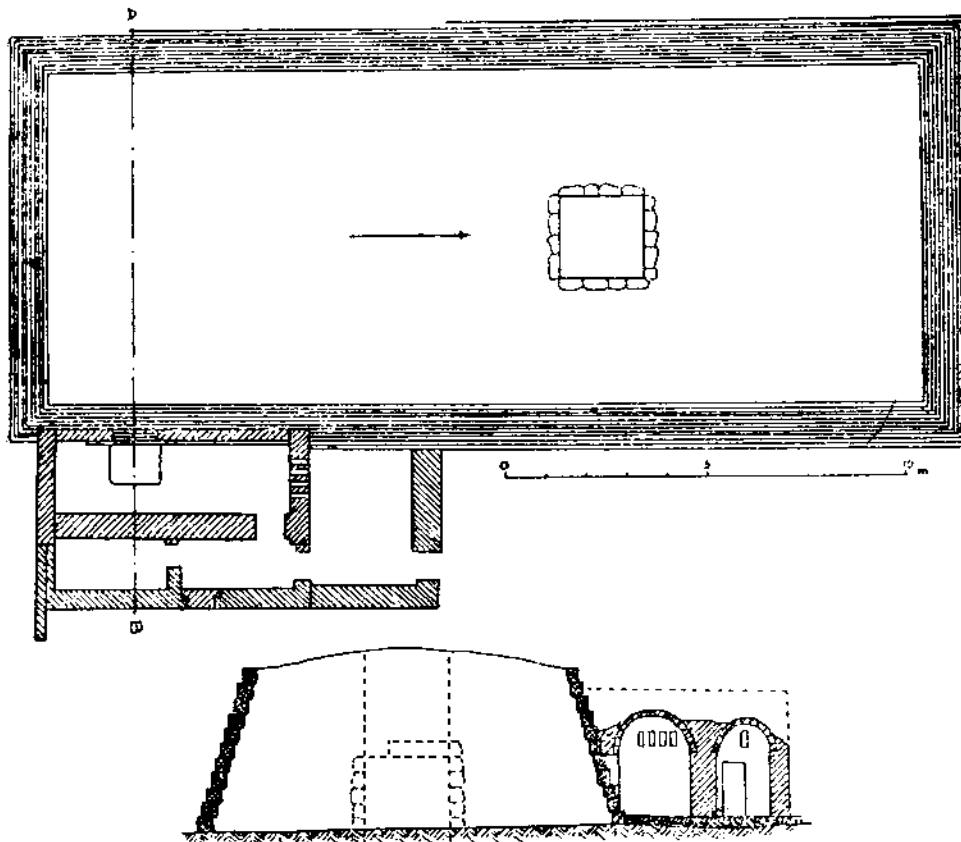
Plan and transversal section in the mastaba of Kanofer (Giza 1203).
